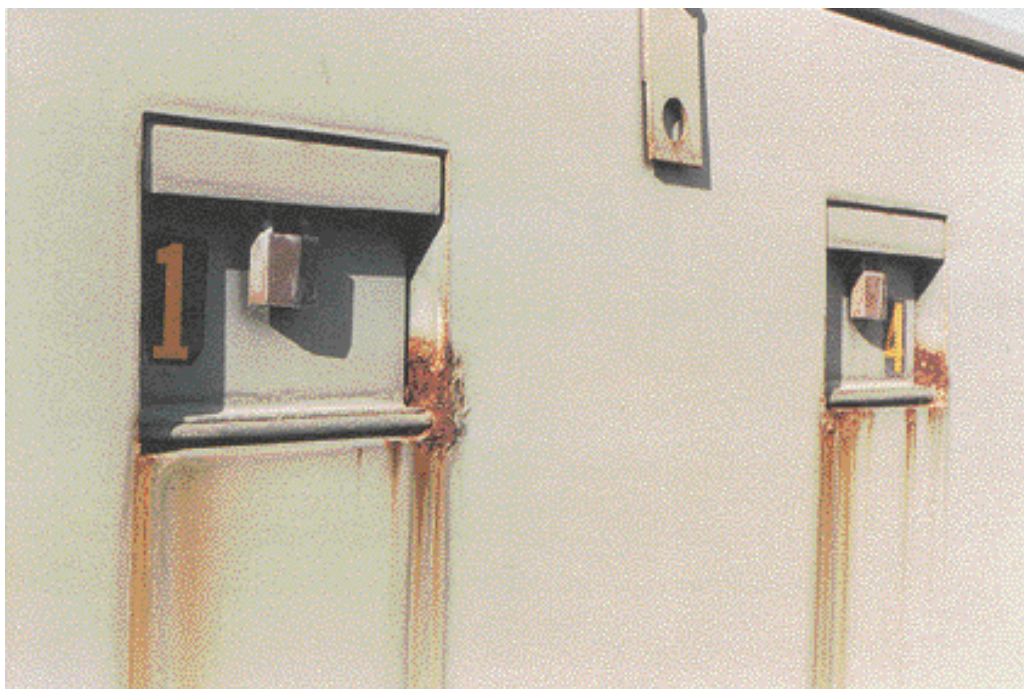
Close-Up of Light Corrosion on Bottom of Door (No Serious Pitting)
